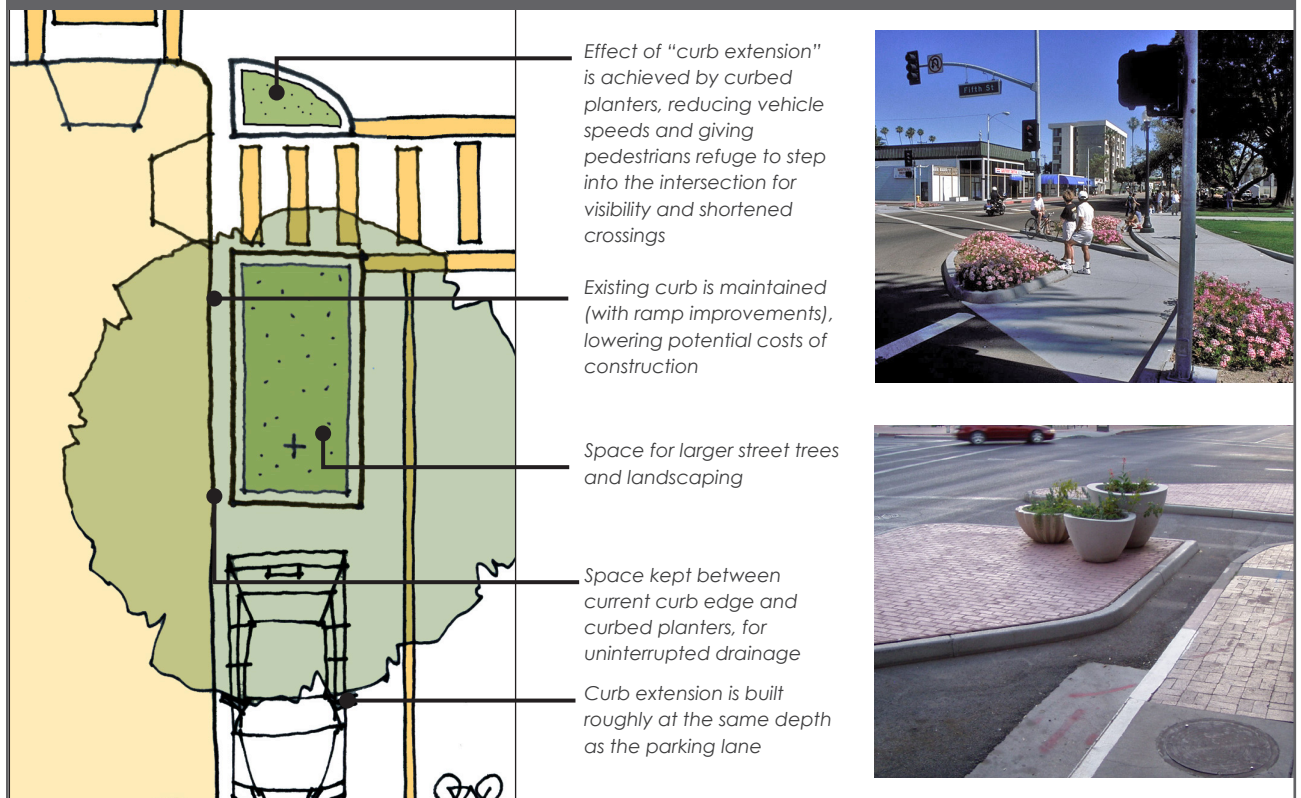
CURB EXTENSION OPTION 2: KEEP SIDEWALK, ADD CURBED PLANTERS
